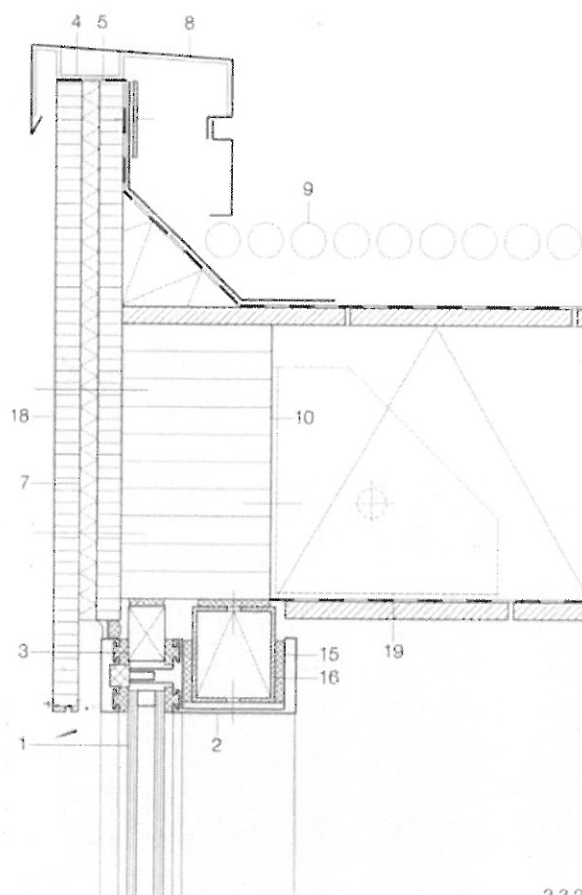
The primary structure here is reinforced concrete. The edge of the slab and the overlying roof construction are clad with a steel plate anchored to the concrete. The posts are fixed to angles welded to this plate. The connection of the upper façade rail to the edge plate is diffusion-tight and airtight. The clearance between glazing and plate should be wide enough to allow cleaning of the glass. Heat reflected from the edge of the slab could lead to stresses in the glass caused by varying heating effects. A stationary layer of air can lead to condensation occurring; the inclusion of ventilation louvers is an advantage.
